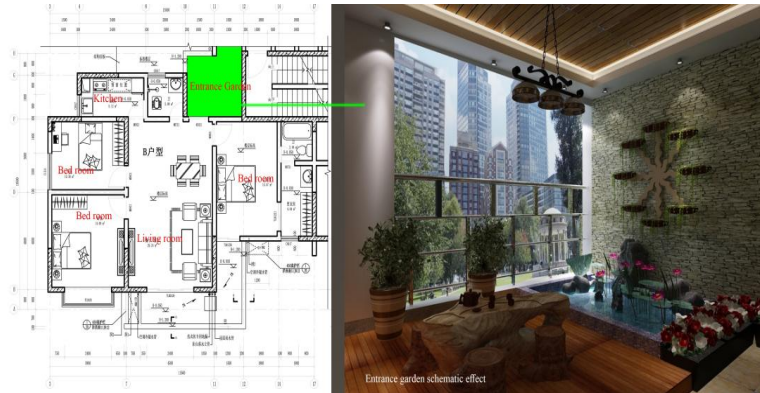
Residential floor plan with entrance garden (designed by the author), schematic rendering of entrance garden (<https://www.nipic.com/show/11053709.html>).
